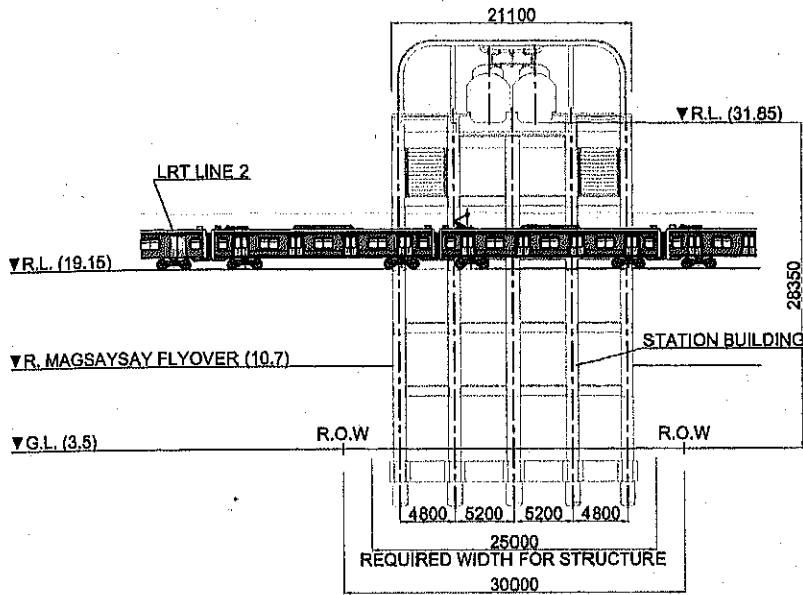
Elevated Station with 2 Platforms & 4 Tracks of Rigid Frame Structure
